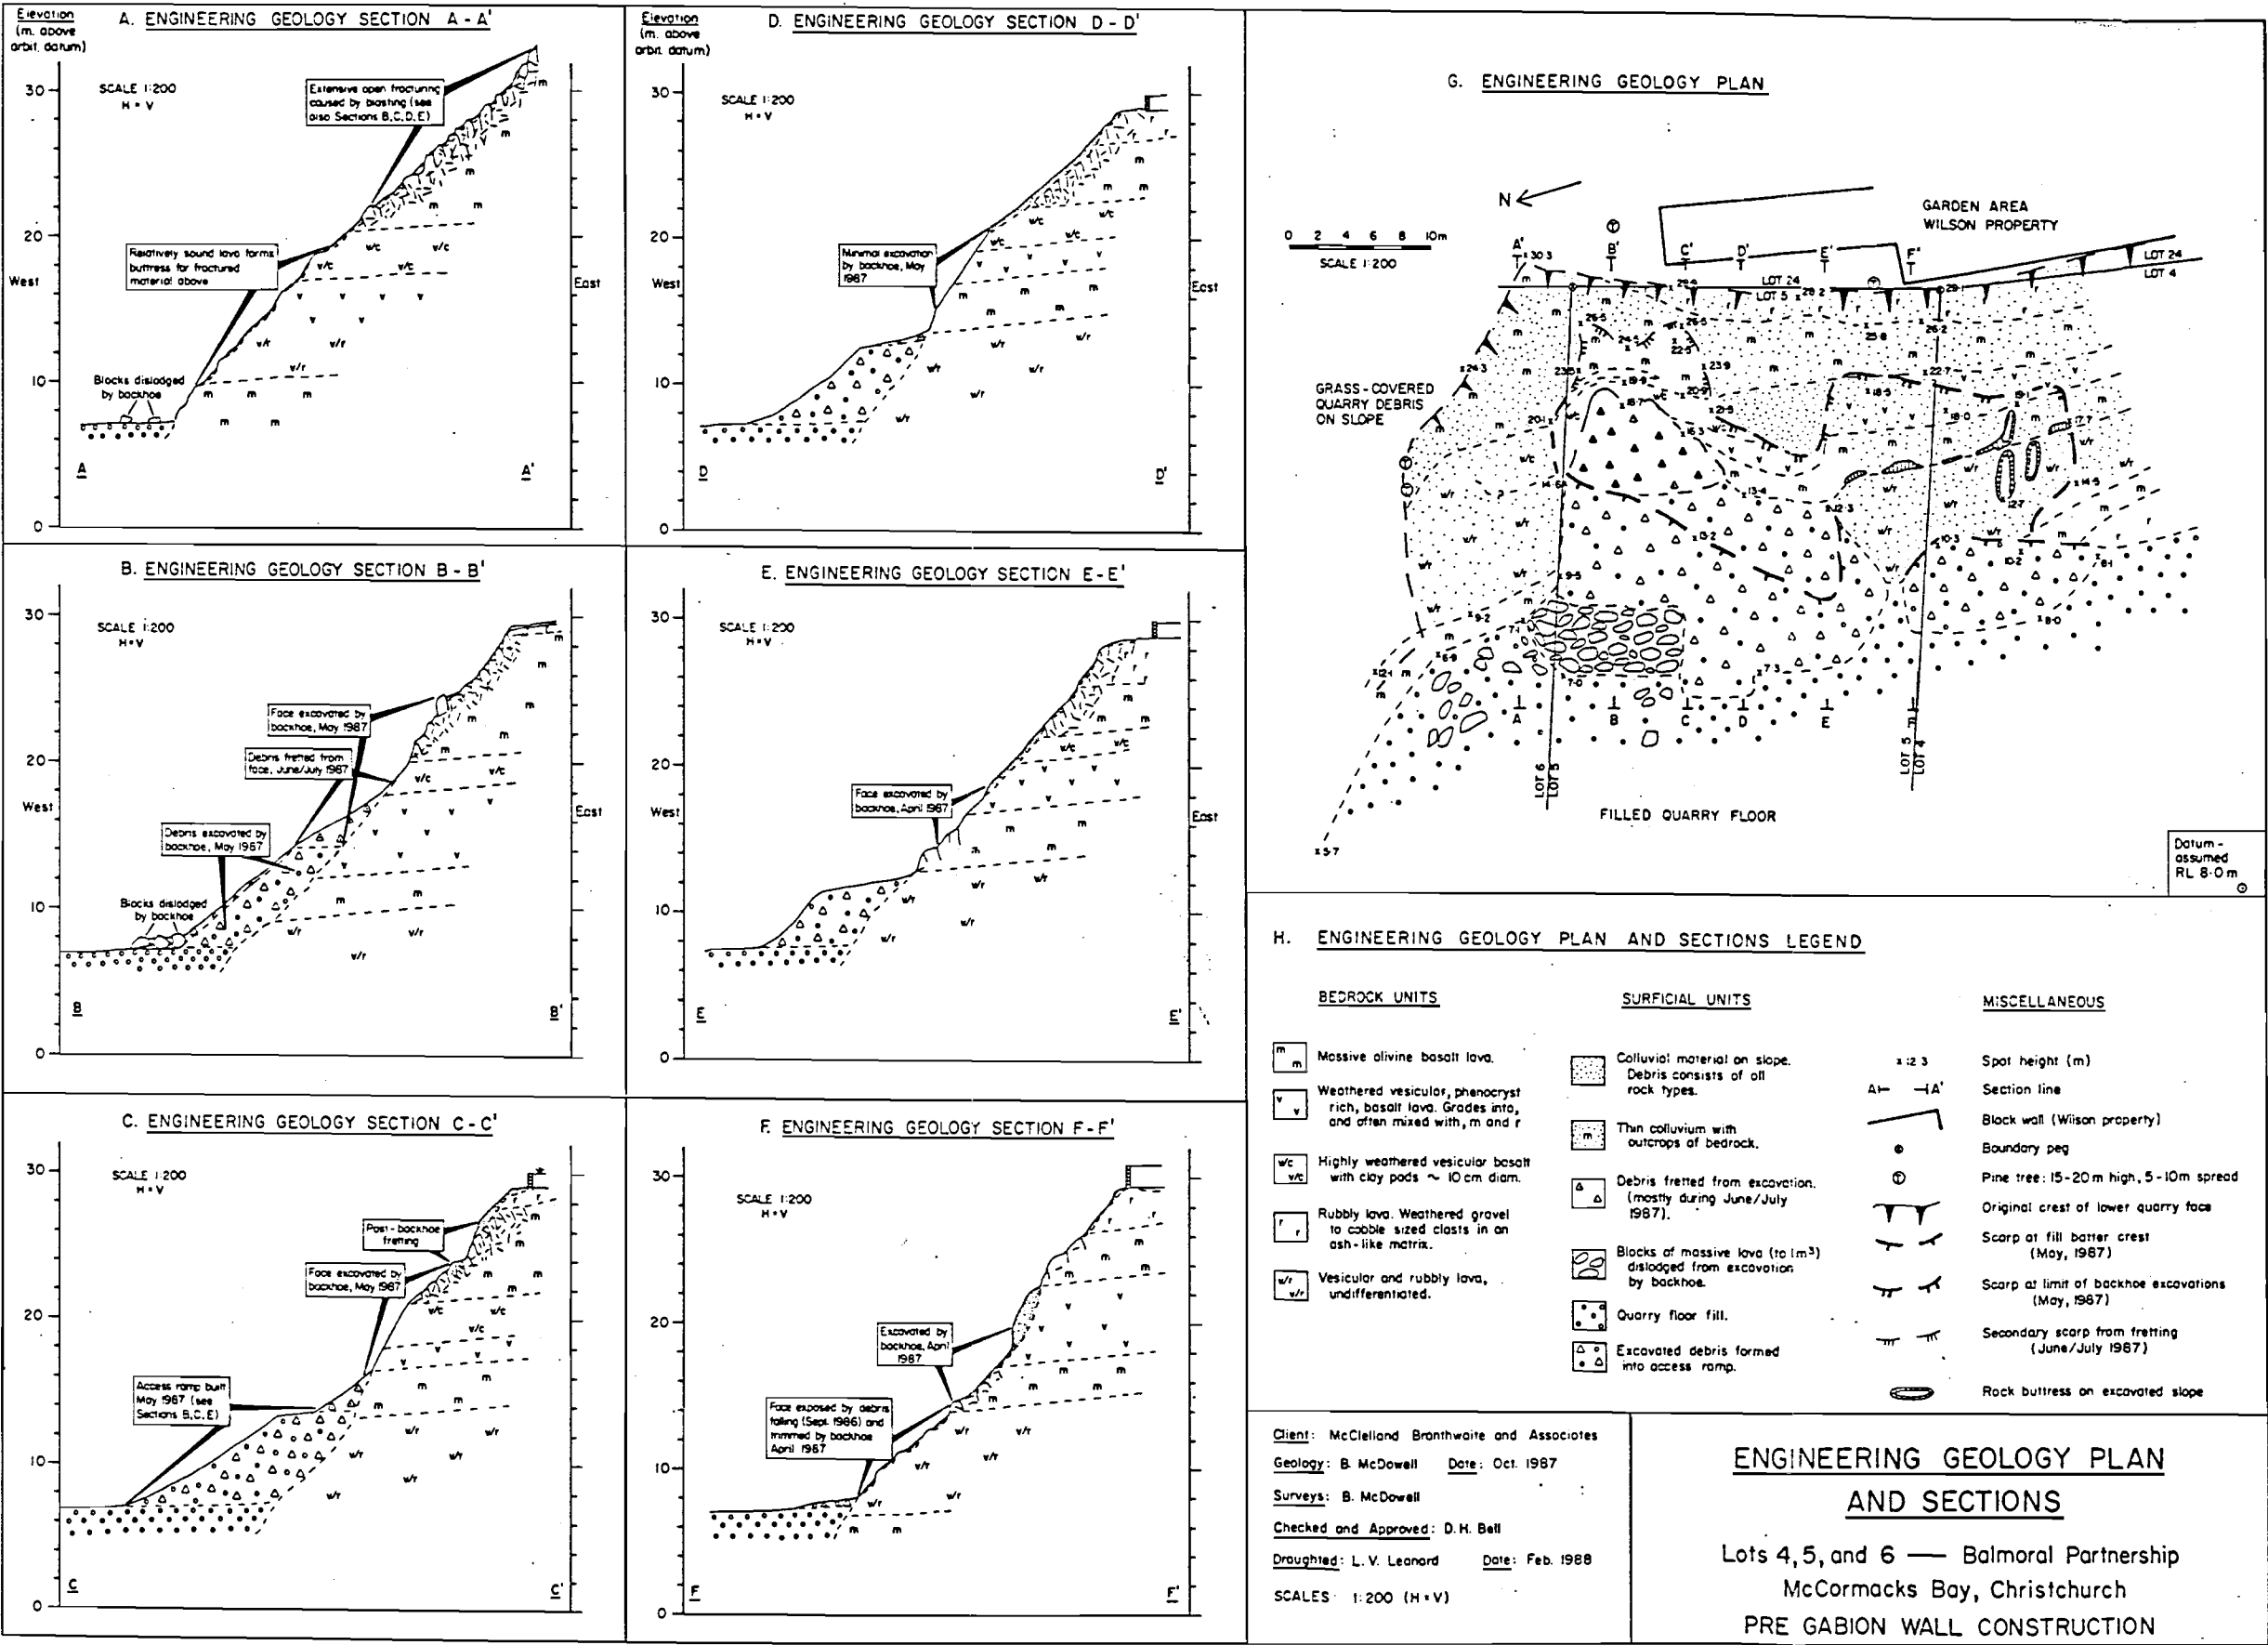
Reduction of Pre Gabion Wall Plan and Sections
